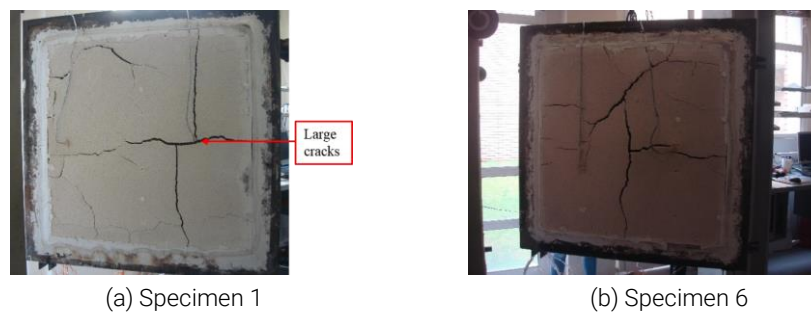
| Exposed surfaces of Specimen 1 and Specimen 6 after the fire test.
